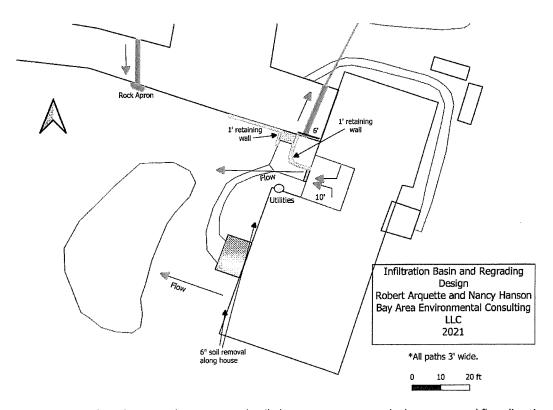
Zoomed in schematics showing more detailed measurements near the breezeway and flow directions of storm water surrounding concerned area of house.
